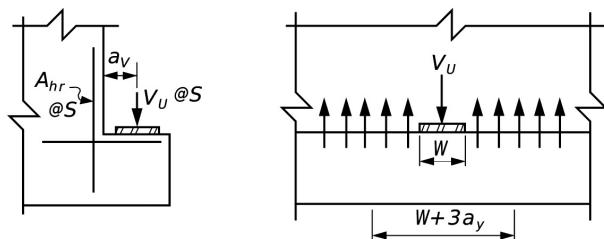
Single-Ledge Hanger Reinforcement
